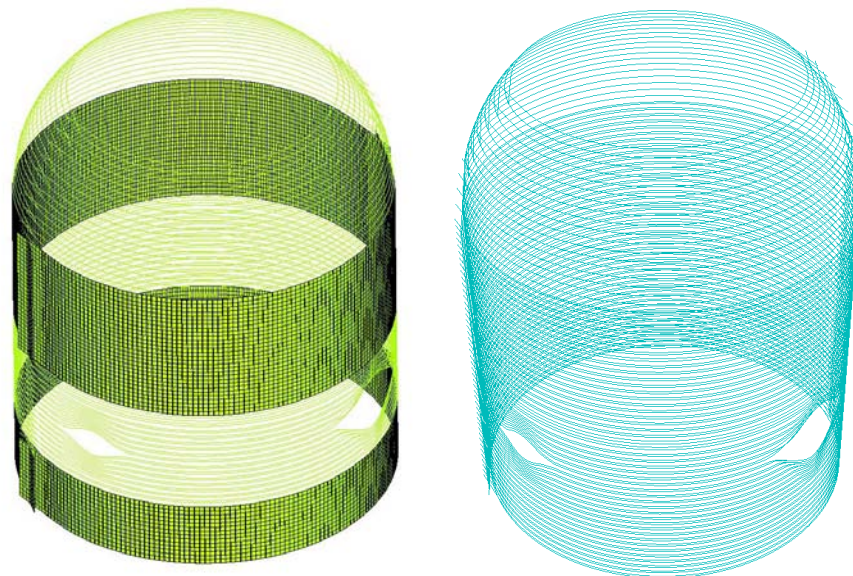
Modeling of horizontal tendons. a) Membrane. b) Truss elements.
